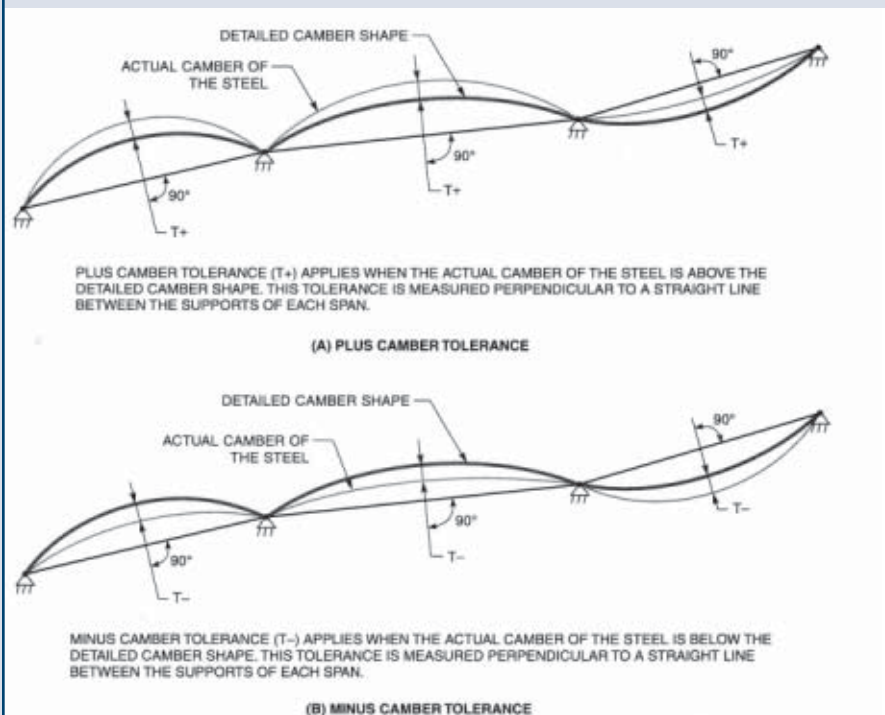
Illustration of Camber Tolerances for Steel Beams
